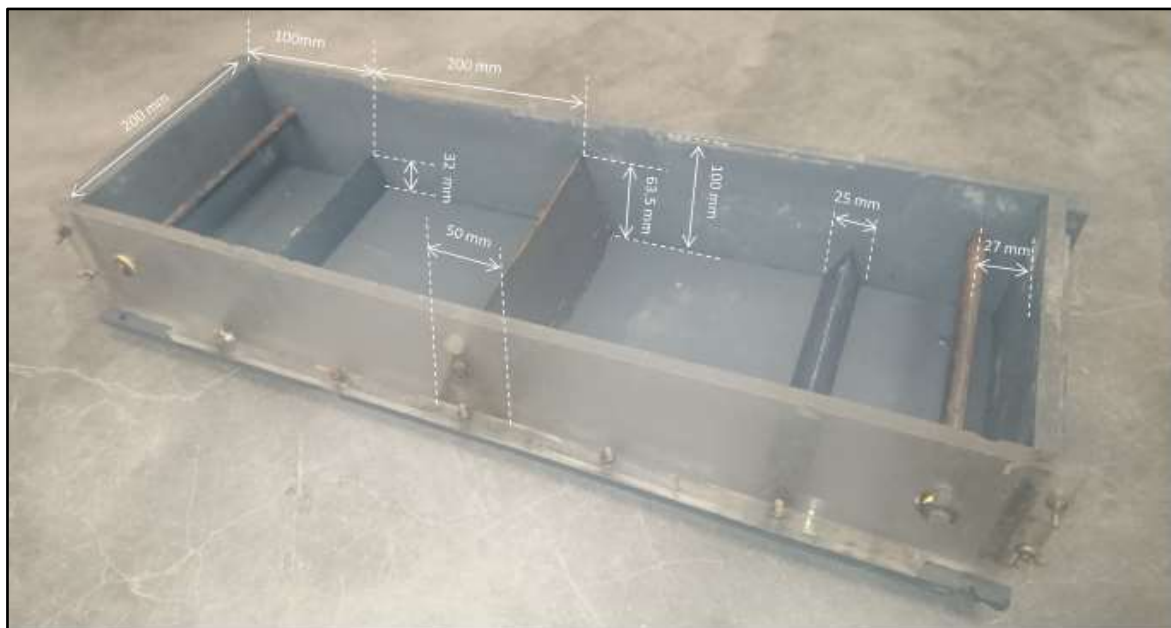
shows the mould used to investigate the cracking behaviour of plastic concrete. Initially the moulds were based on the proposed mould design by ASTM C1579 (2006) to investigate plastic shrinkage cracking, however, these moulds were later modified to add an
